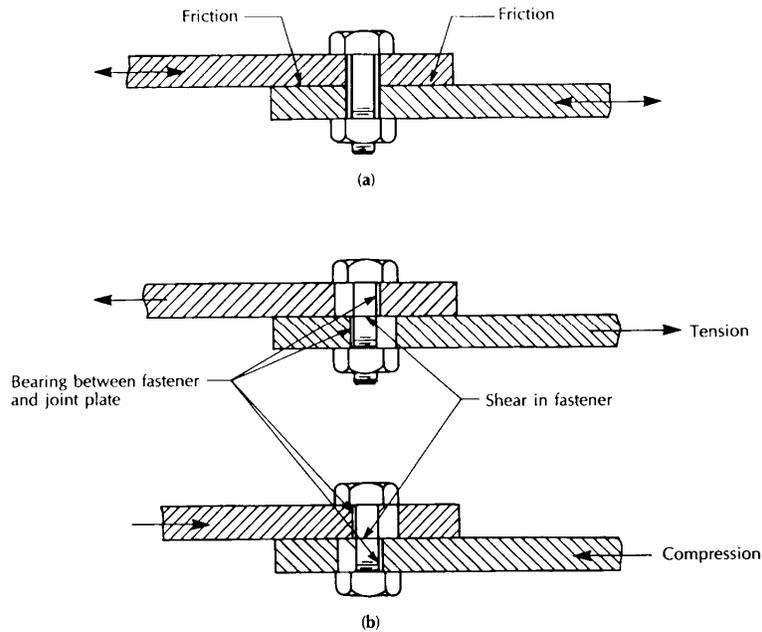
Illustrating differences between (a) friction-type joints and (b) bearing-type joints; in the latter case the load is transferred essentially through the fastener, thus introducing a shear stress across the fastener.⁶⁶
